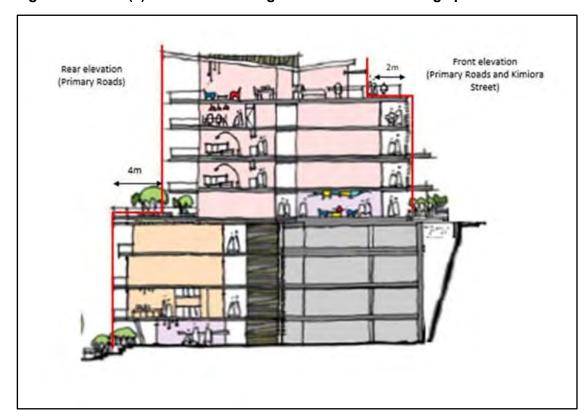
B(5) Minimum building setbacks for cascading apartments
